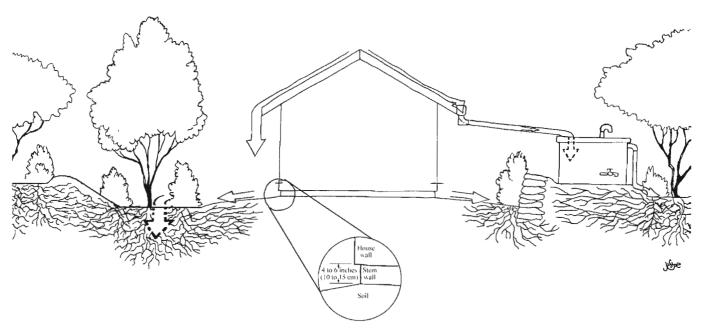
B. The house with the landscape regraded to drain and harvest water away from the house to eliminate flooding and passively irrigate the vegetation. Note: A space between the top of the building's stem wall and the wall of the house is kept free of soil to prevent moisture and subterranean termites from entering the wall.
